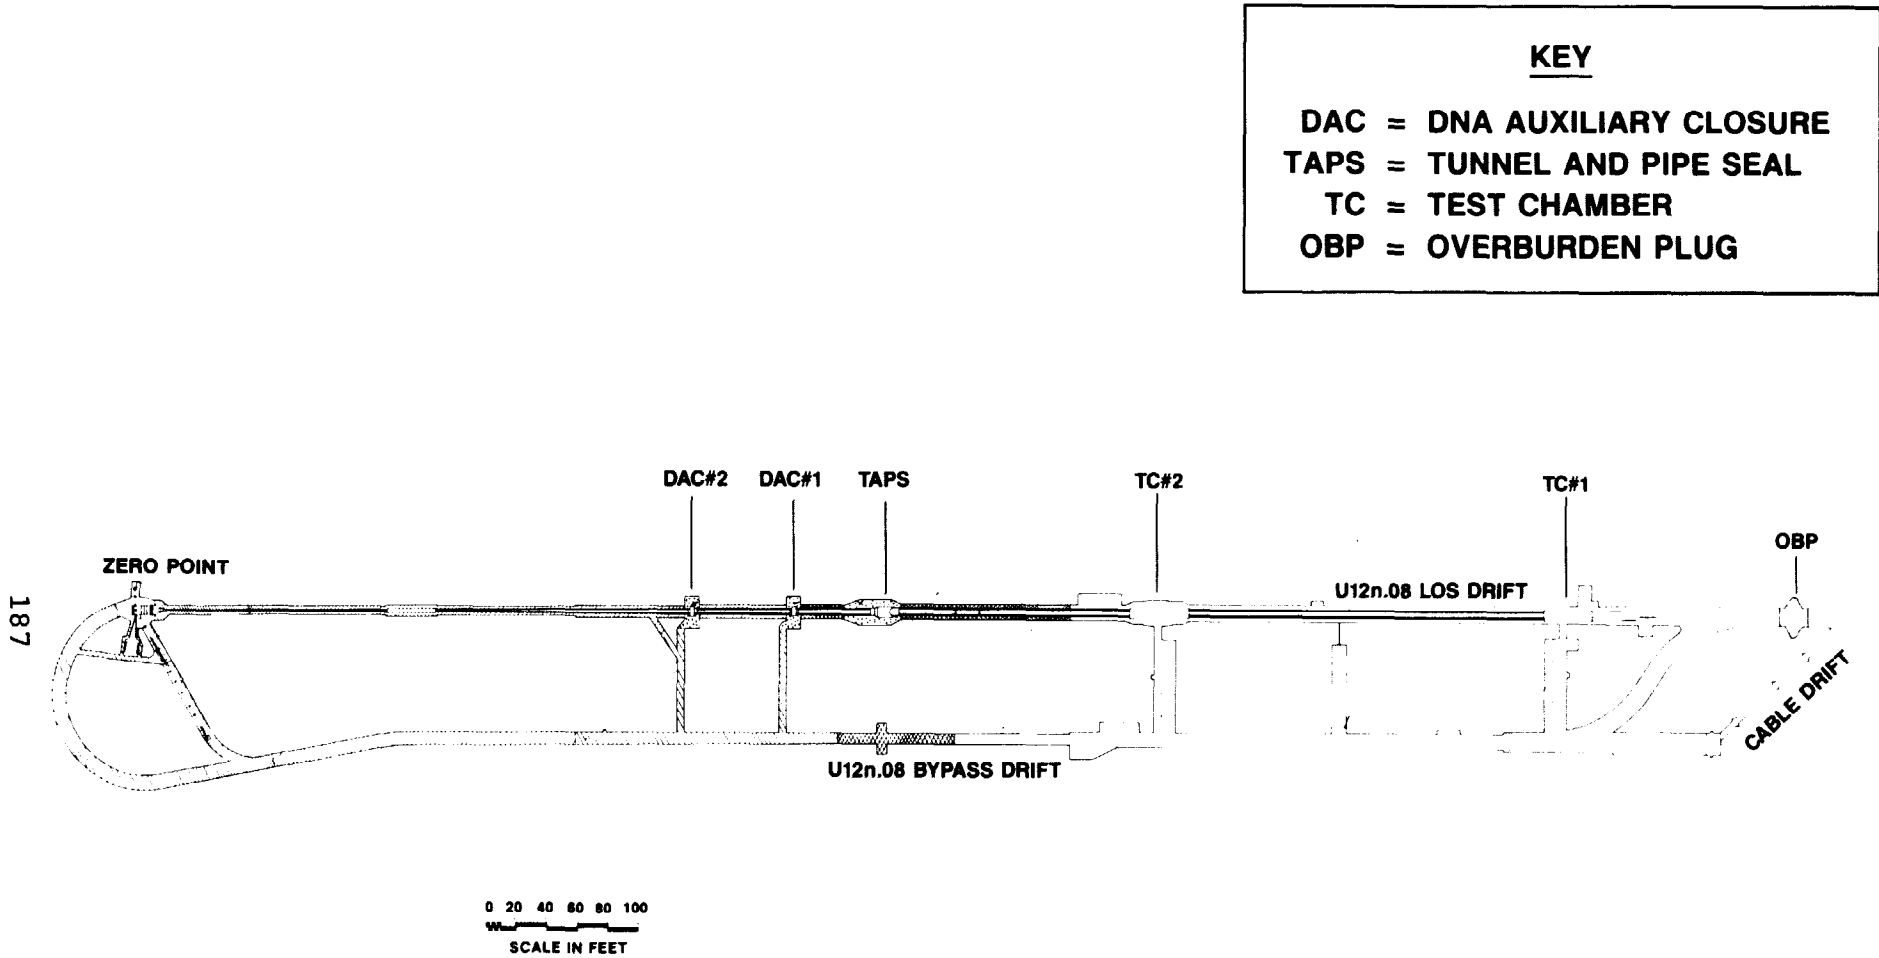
MING BLADE Event - Tunnel and Pipe Layout
